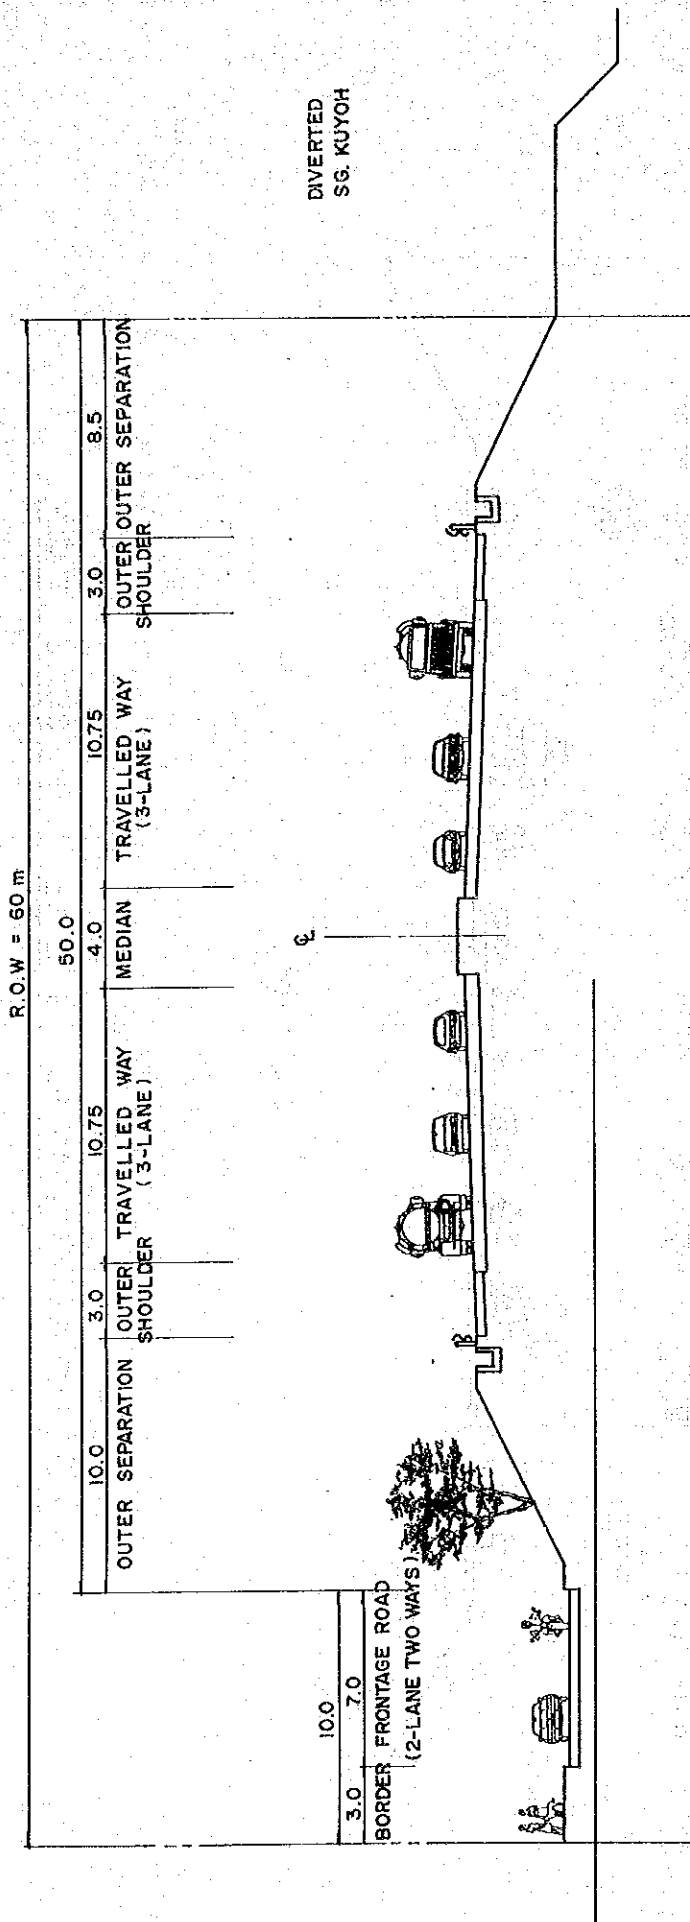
TYPICAL CROSS-SECTION FOR 6-LANE WITH CYCLE TRACK. LEGEND:
